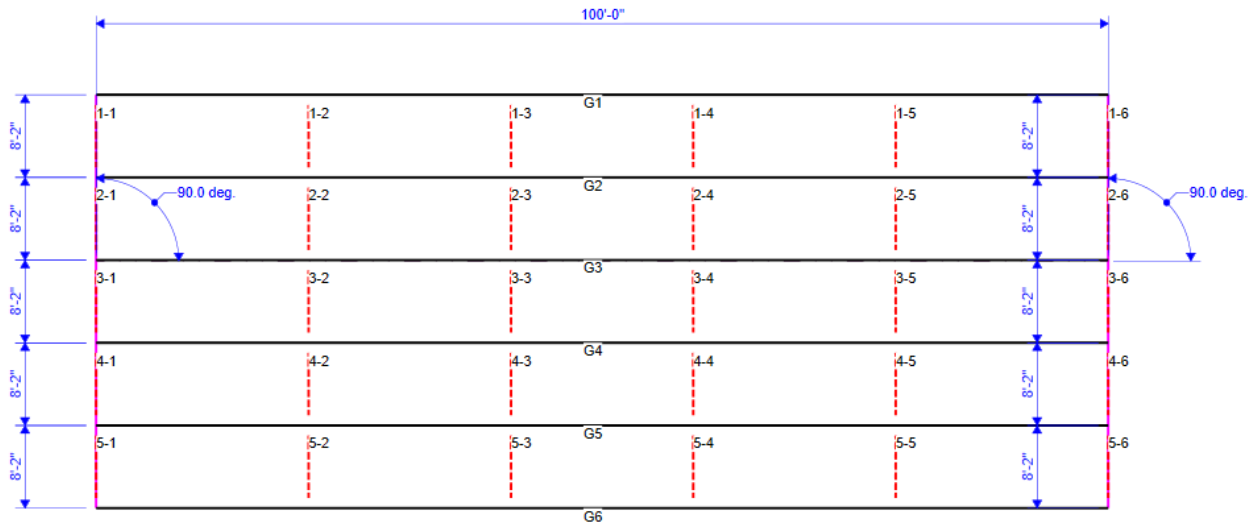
Bridge Plan View for S080 00526 (AASHTOWare™ BrR, 2023)
